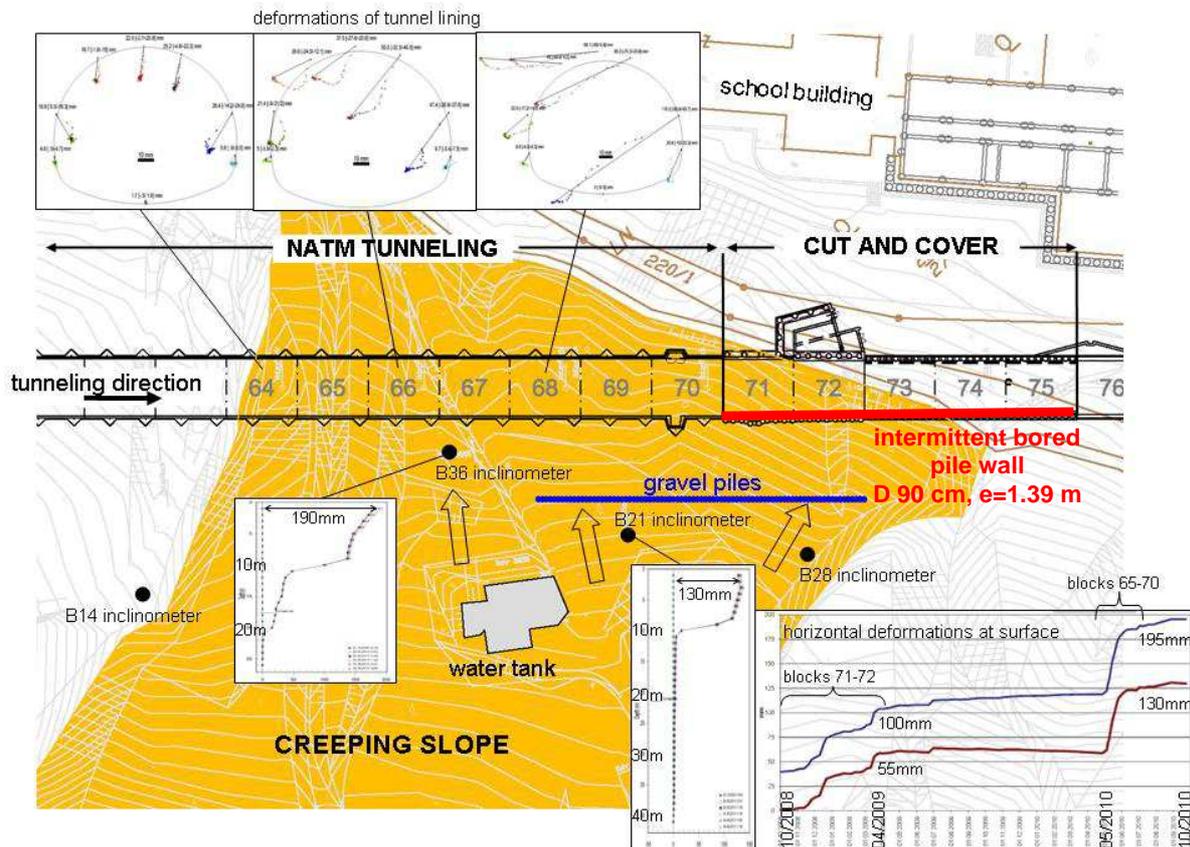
City Tunnel Waidhofen an der Ybbs. Ground plan of the tunnel within the creeping slope. The location of the gravel piles, the water supply tank and the inclinometers are shown as well as the results of inclinometer measurements and deformation measurements at the tunnel lining.
